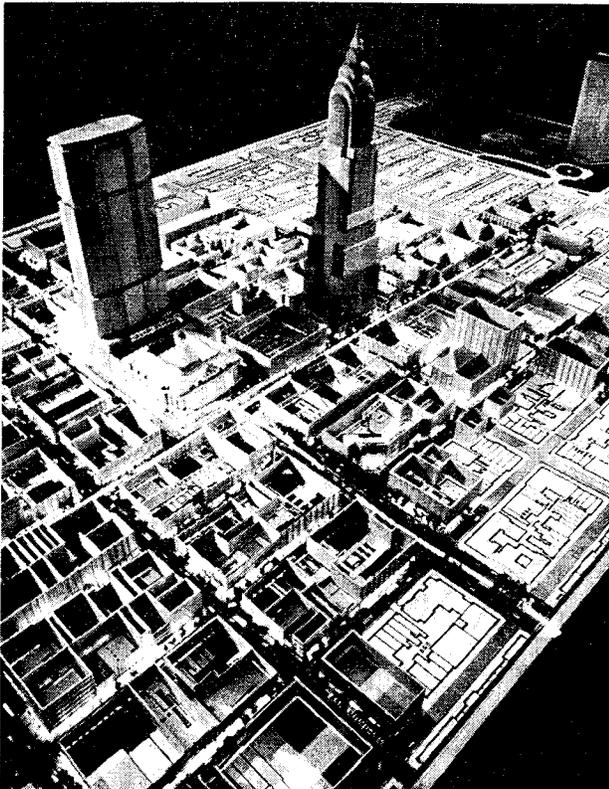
Model of Proposed Improvements, showing 42nd Street, the Chrysler Building, Grand Central Station and surrounding district (Grand Central Partnership).
